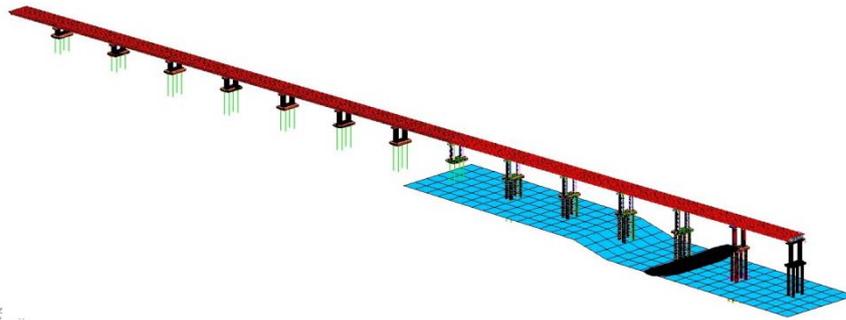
Finite element model of the Jiujiang Bridge under barge collision
